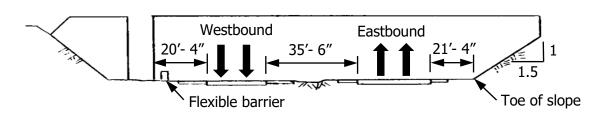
Bridge elevation view of horizontal clearances for separate westbound and eastbound highway features below the bridge, with a flexible barrier.
